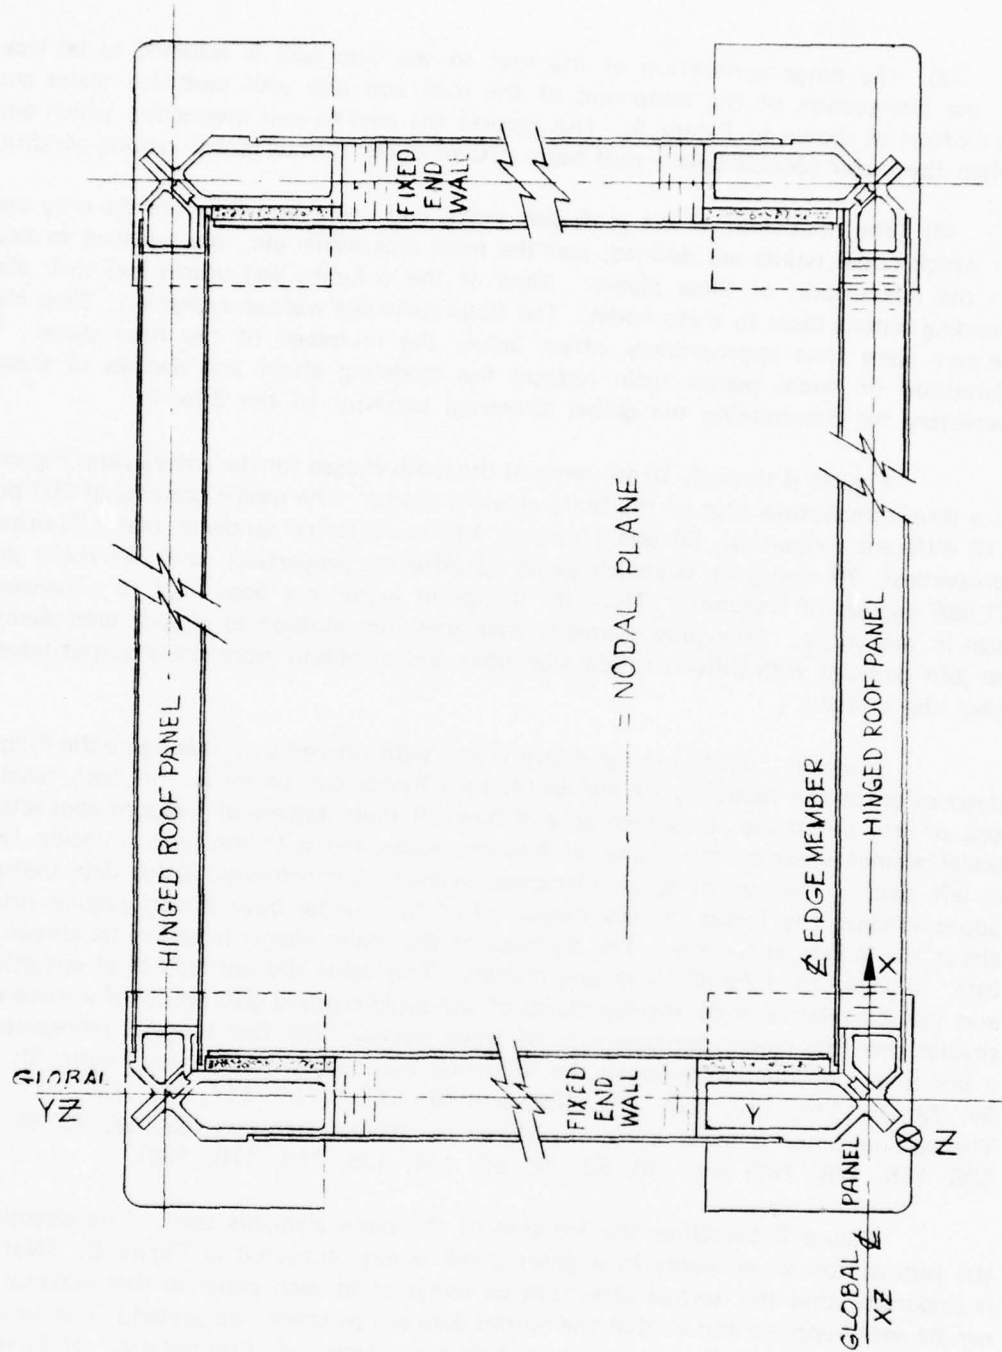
PLAN SECTIONAL VIEW C-C OF SHELTER.
